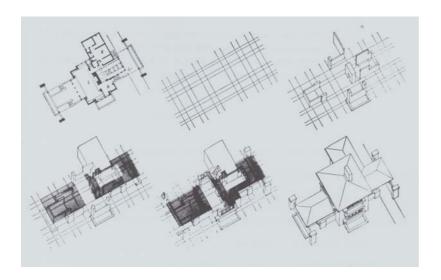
Detached Corner Piers in Robert Evans House, Longwood, Illinois, 1908.64
